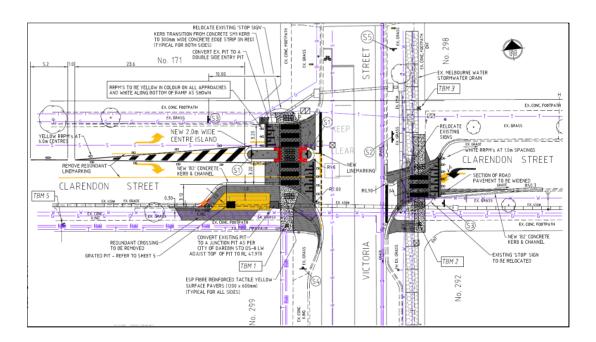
VICTORIA ROAD/CLARENDON STREET PROPOSED INTERSECTION REDESIGN
